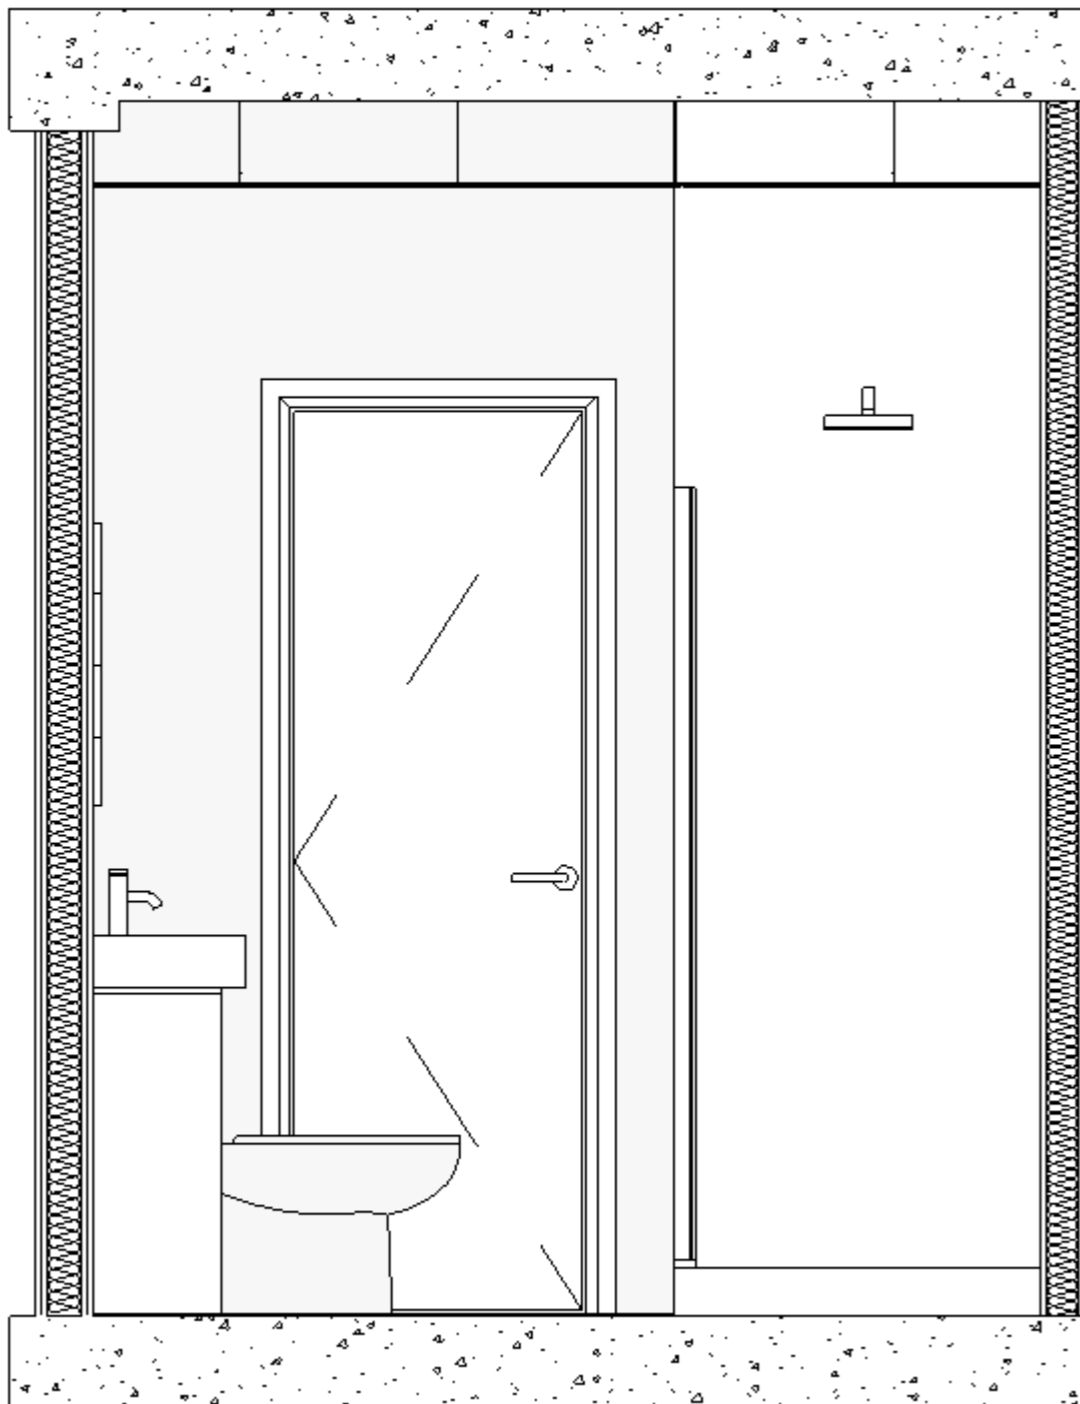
Enlarged Student Bathroom Section (Author, 2021)
